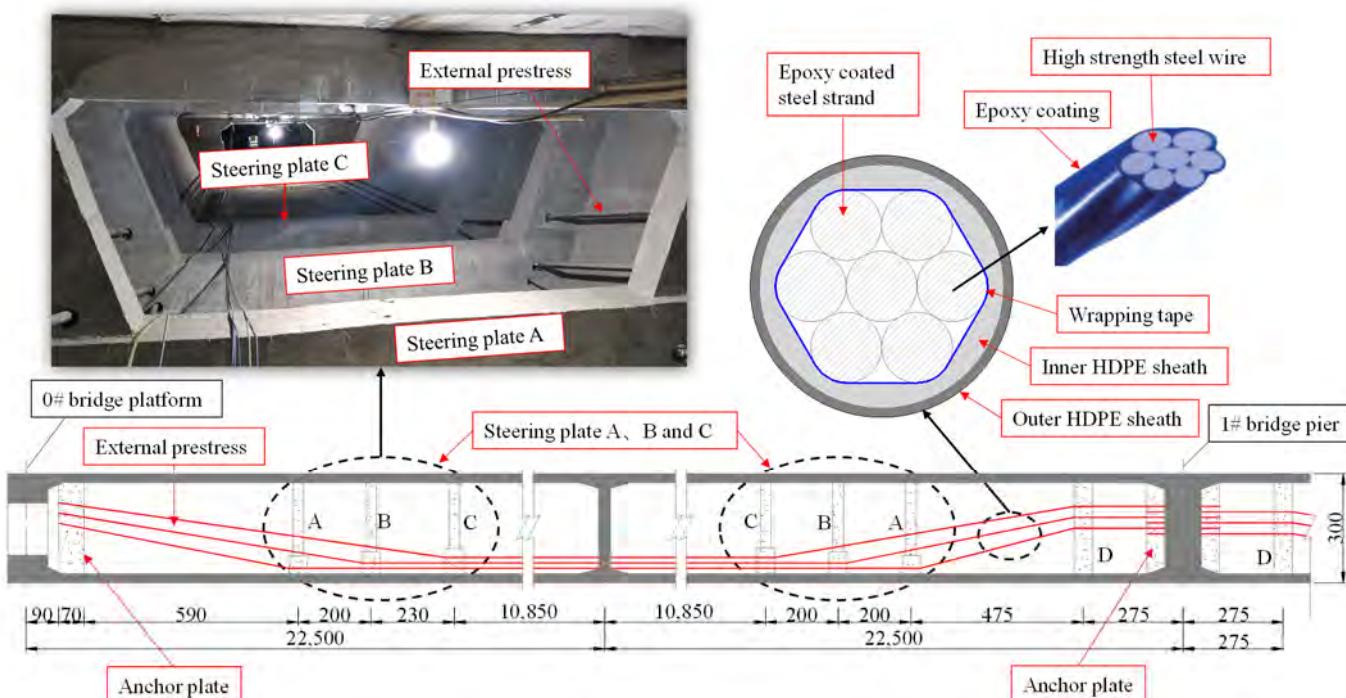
Diagram of the external prestressing arrangement of the first span (unit: cm).
